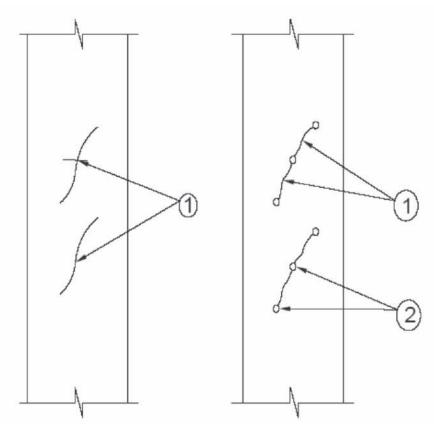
Repair of damaged columns with slight cracks (1. Cracks; 2. Injection ports)
